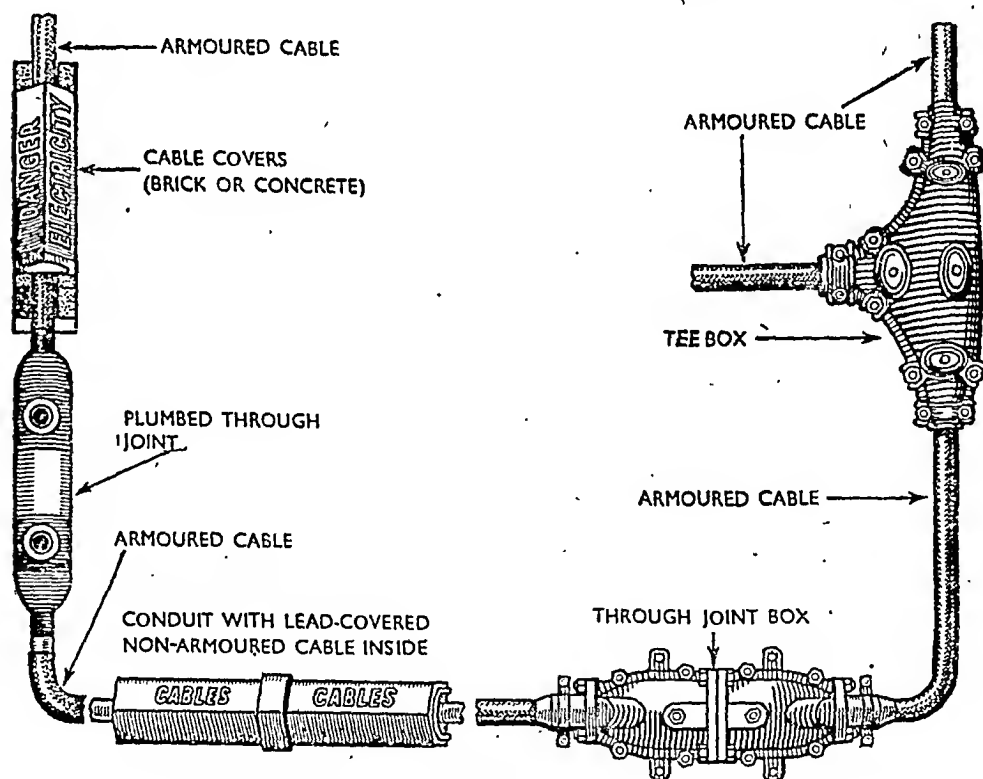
gives typical examples of underground cables. The conductors are usually of tinned copper. The insulation, and the covering to
